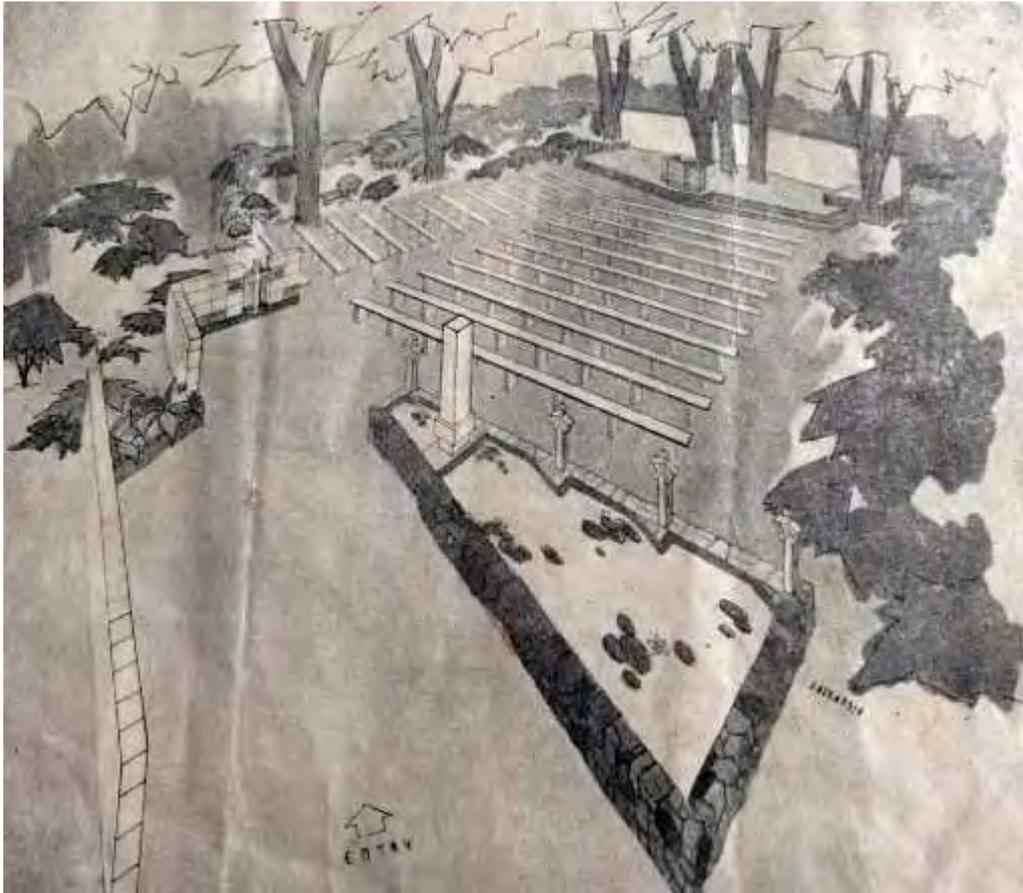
First design of the Chapel, constructed primarily of brick with entrance wall and "sounding wall" behind the pulpit. (Melbourne's Manhood, Feb 1947)
